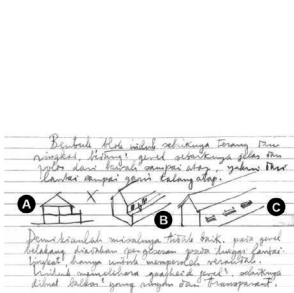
Silaban’s sketches of the back veranda and back balcony⁸⁾
